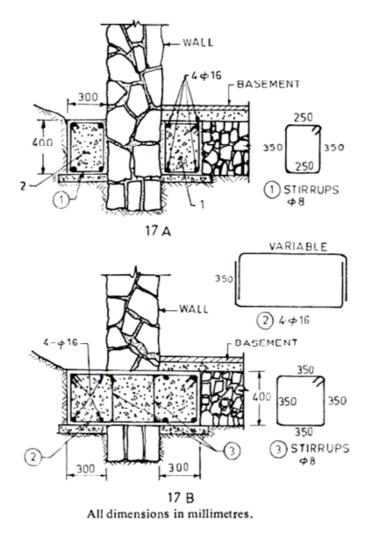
Strengthening Existing Foundation (R.C. Strip on Both Sides)
